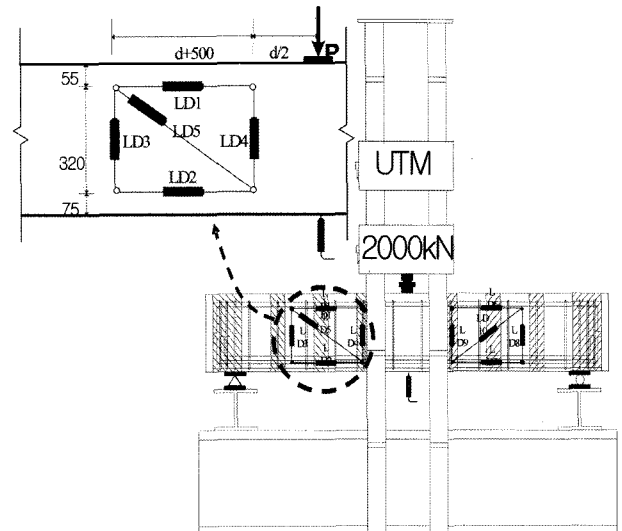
Loading system and locations of LVDTs (unit: mm)
